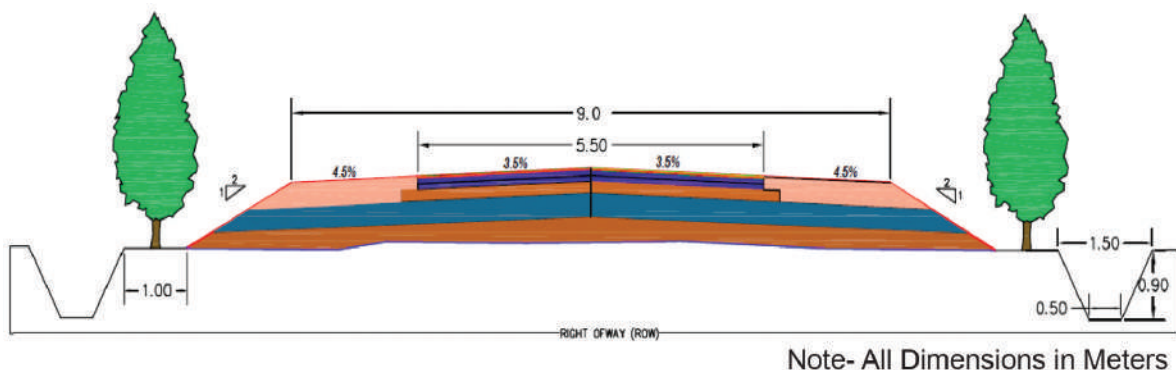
Typical Cross-Section for Intermediate Lane (5.5 m Carriageway); with 9.0 m Formation Width in Rural Area
